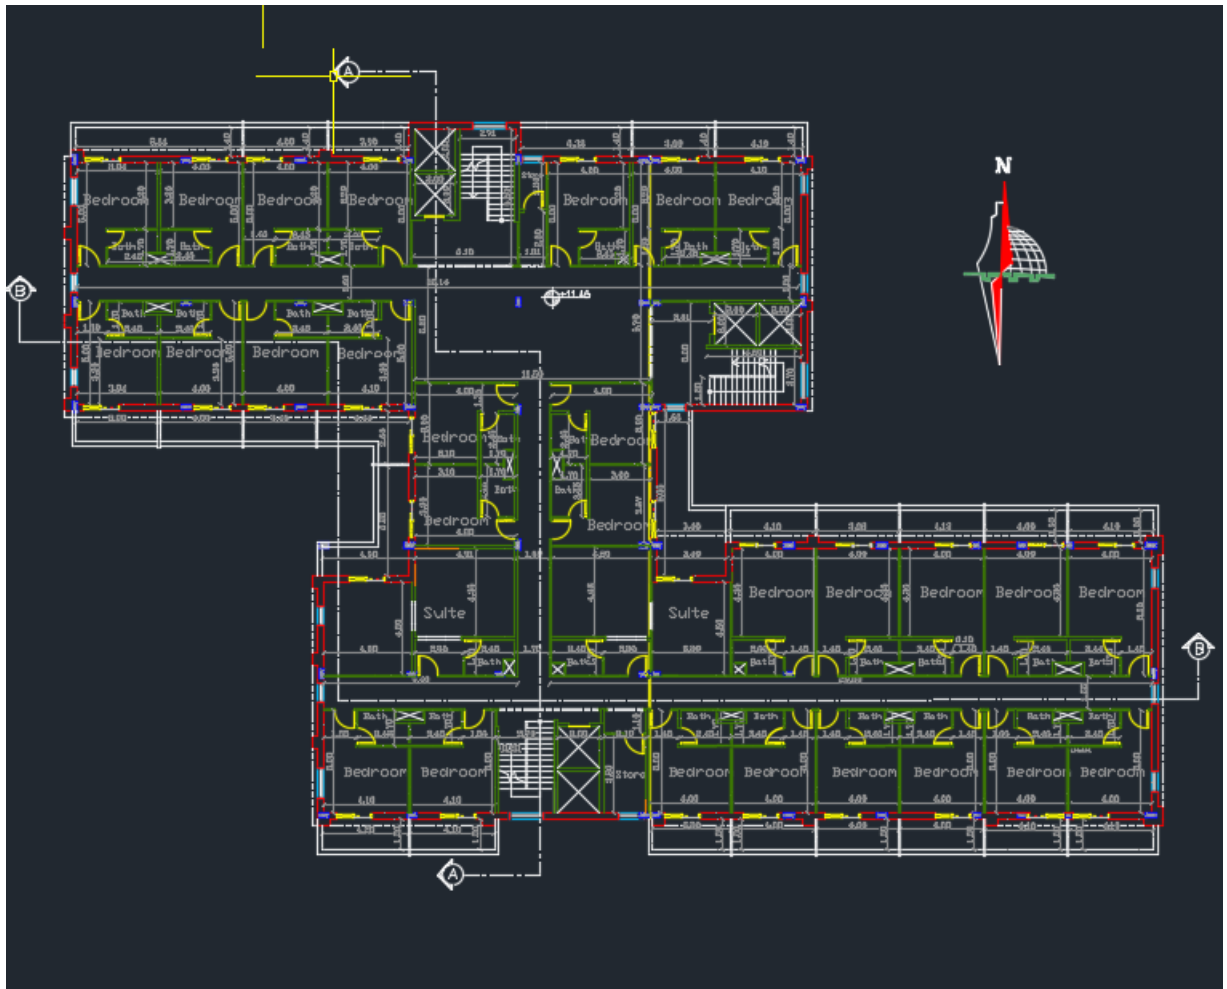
6: 2<sup>nd</sup> -5<sup>th</sup> floor plan
